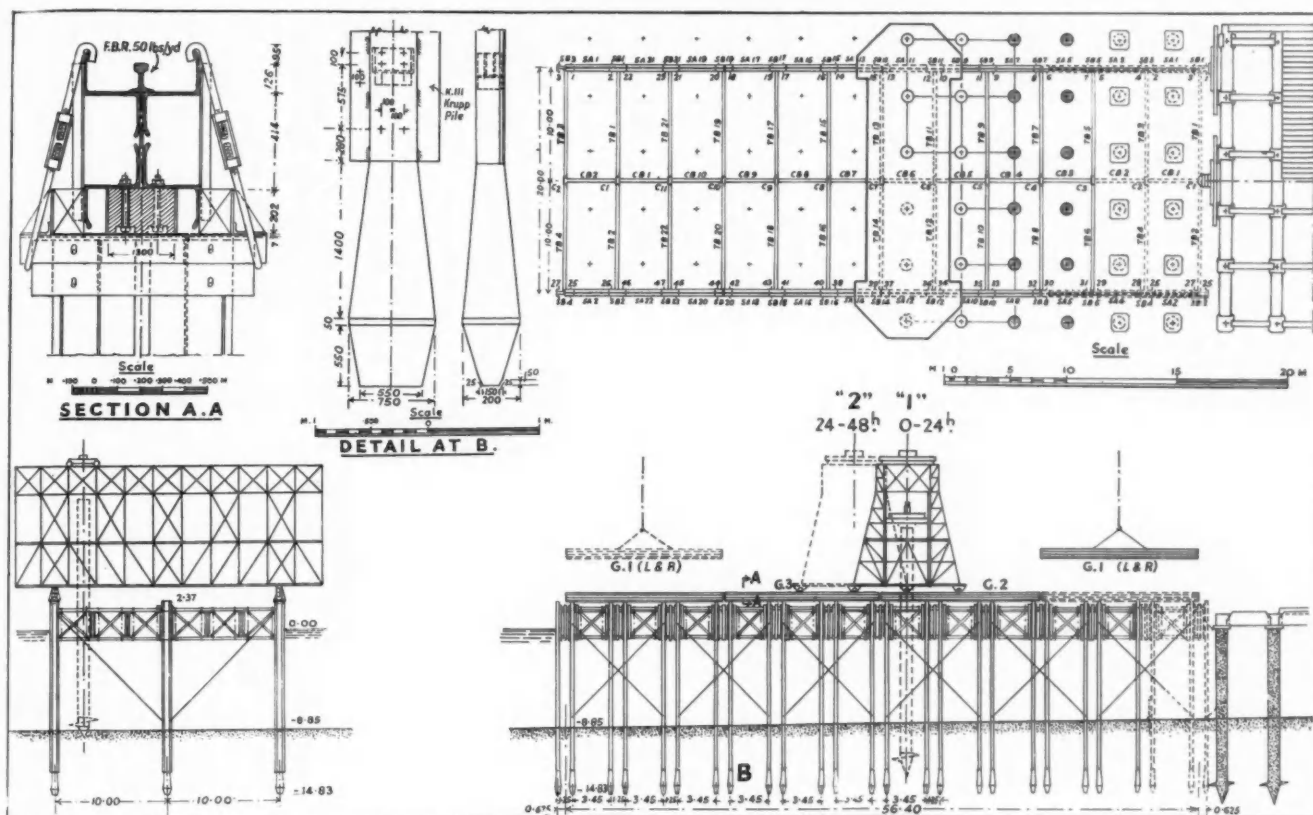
Plan and elevations of gantry with details at A—A and B.
